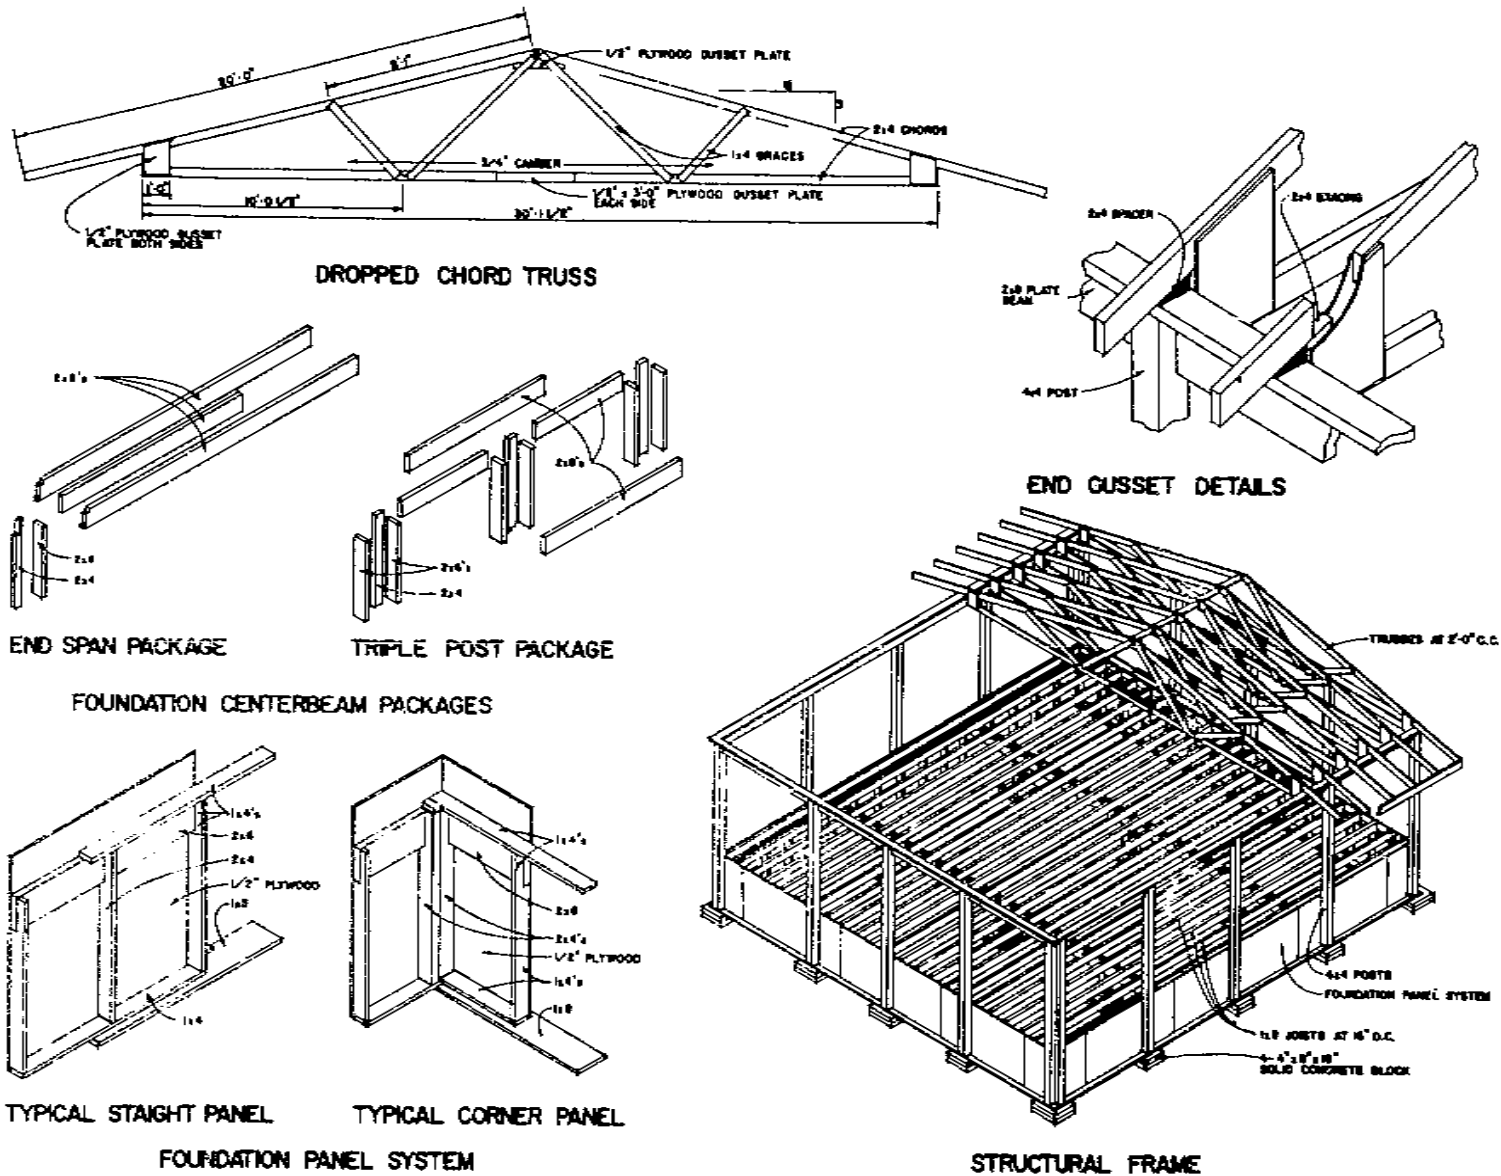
Structural frame, dropped-chord truss, end gusset, and foundation panels and packages for second-generation house.
